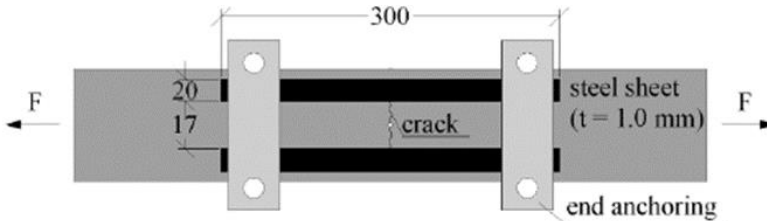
Centre-notched specimens with single-sided adhesively bonded CFRP strips and end anchoring [10]
